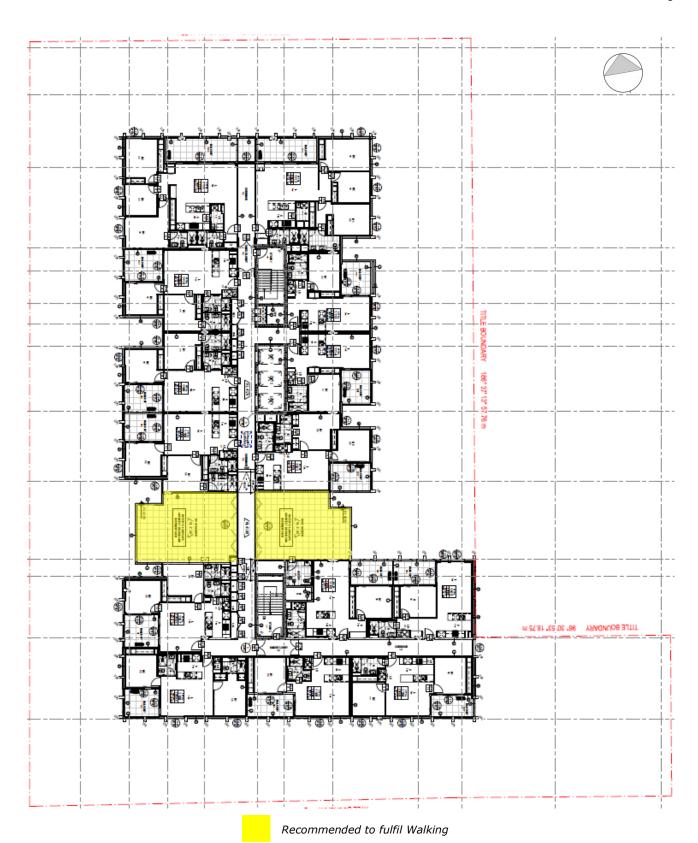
Level 11 floor plan with the recommended wind criteria overlaid.
